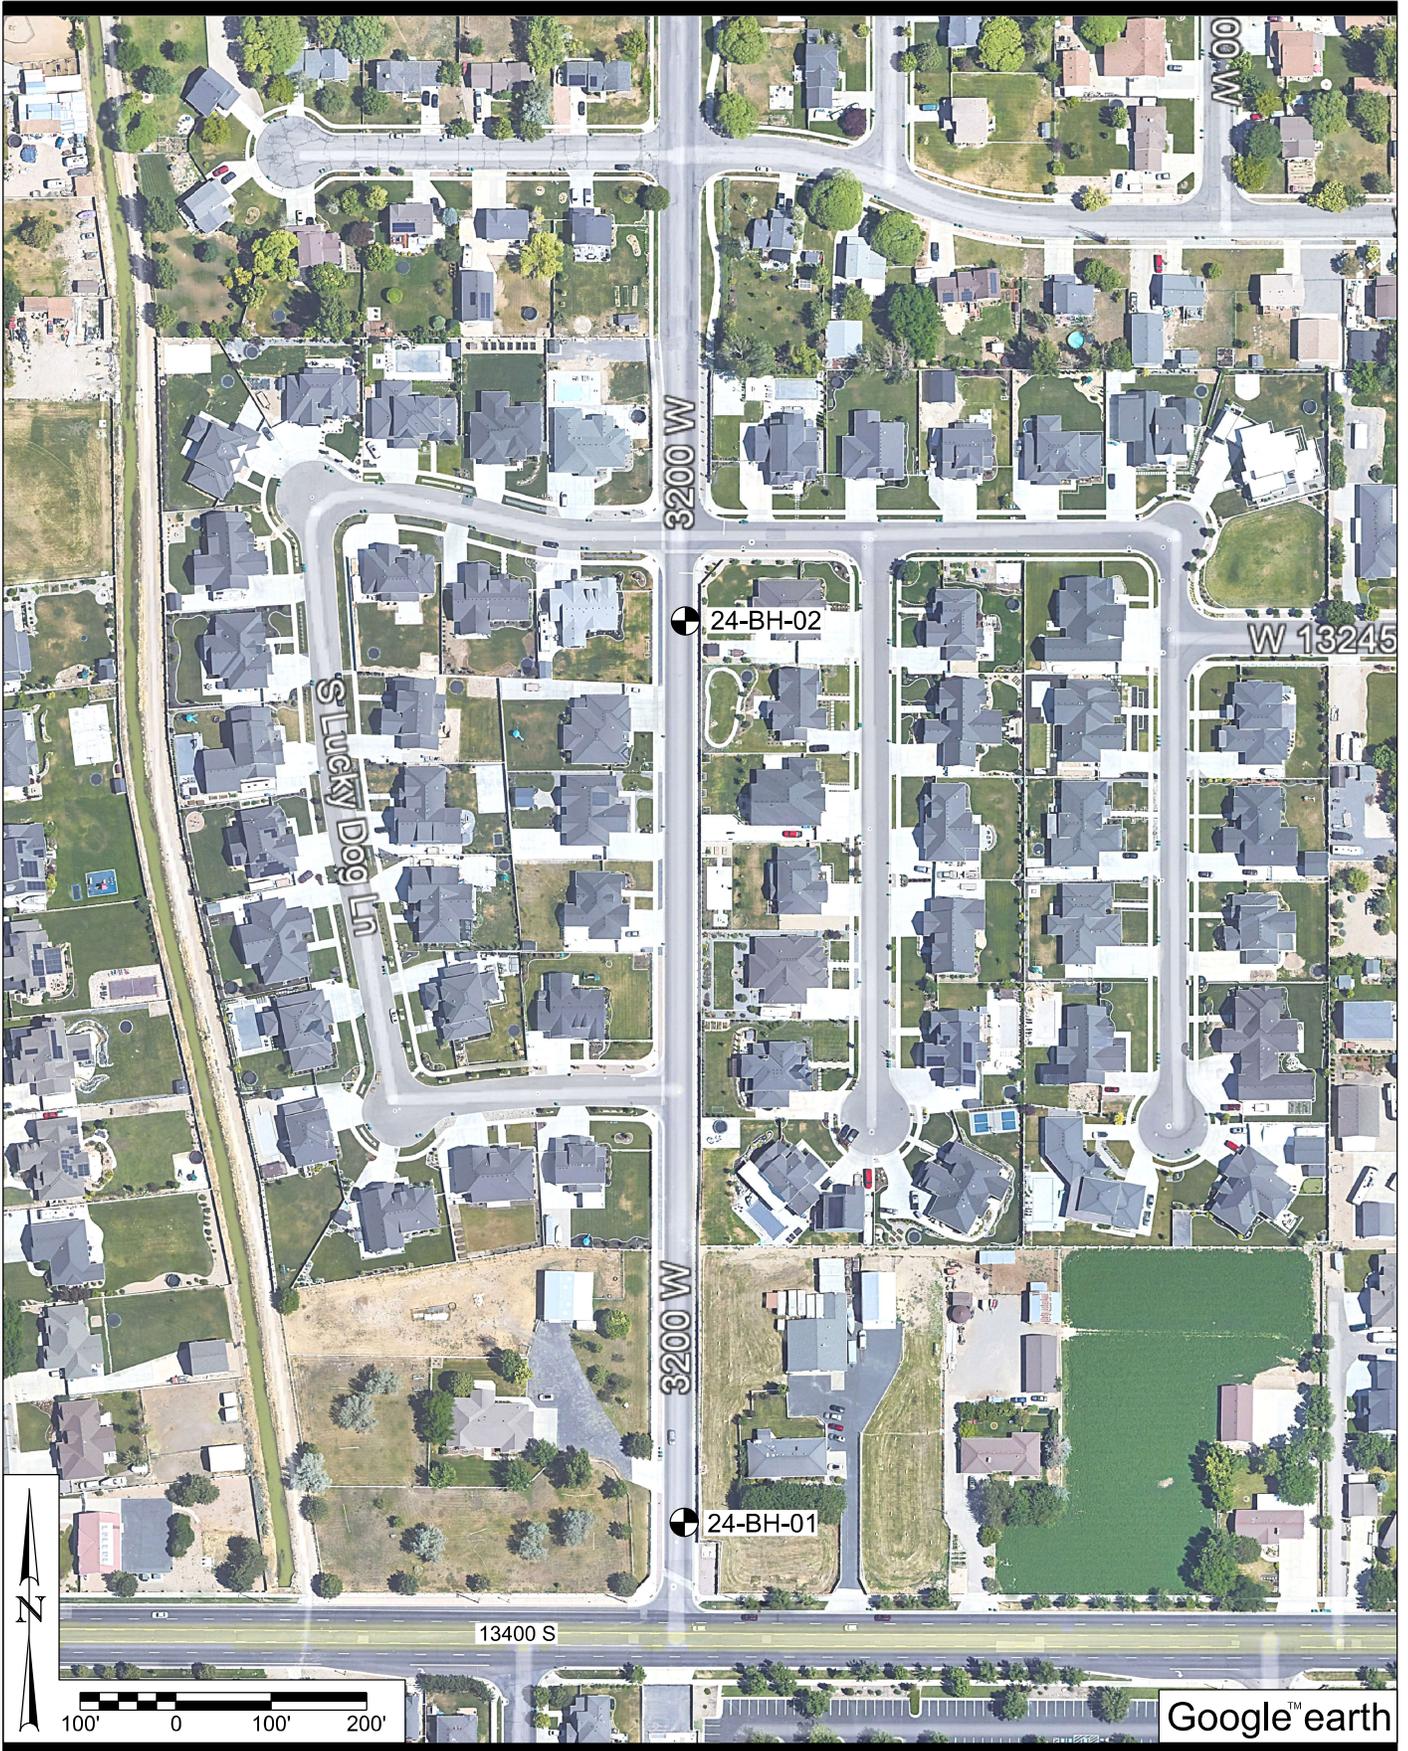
SITE PLAN & TEST HOLE LOCATIONS
